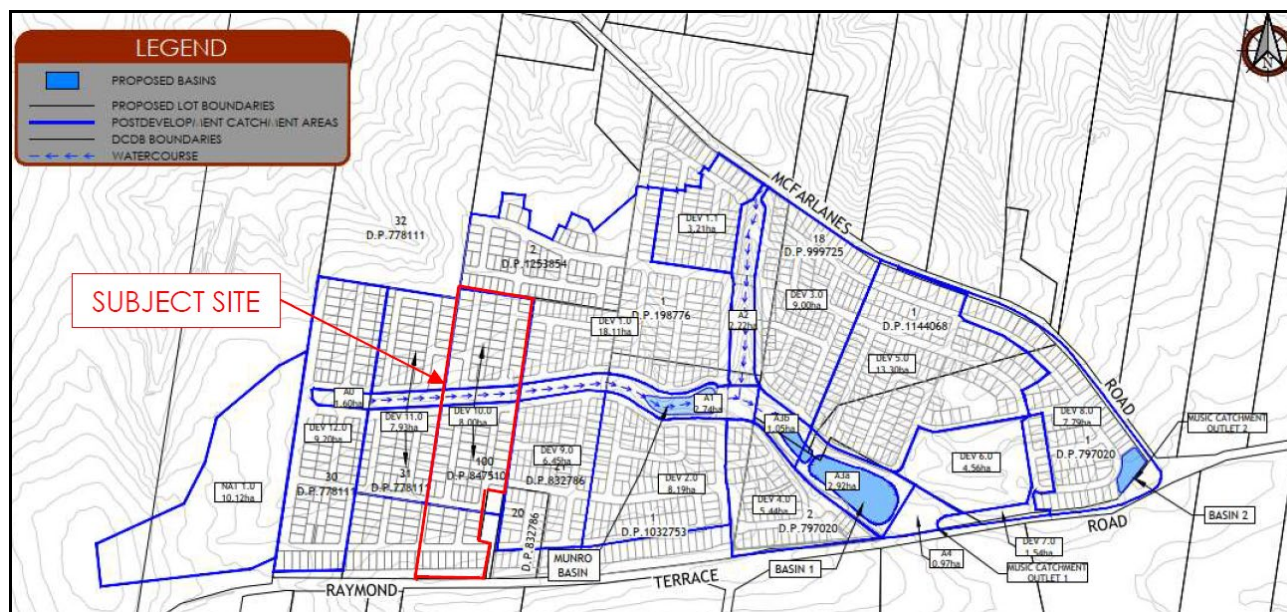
Subject Site in Context with Regional Stormwater Strategy
